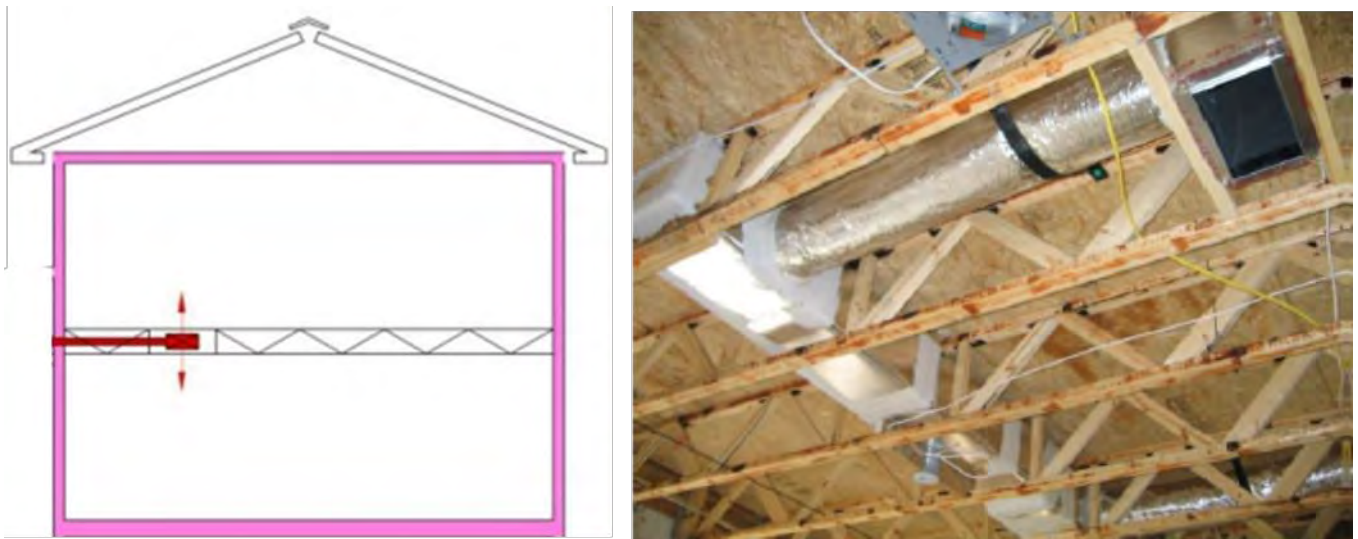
Open Web Floor Truss (adopted from Ductsinside.org and Steven Winter Associates, Inc. 2014)
